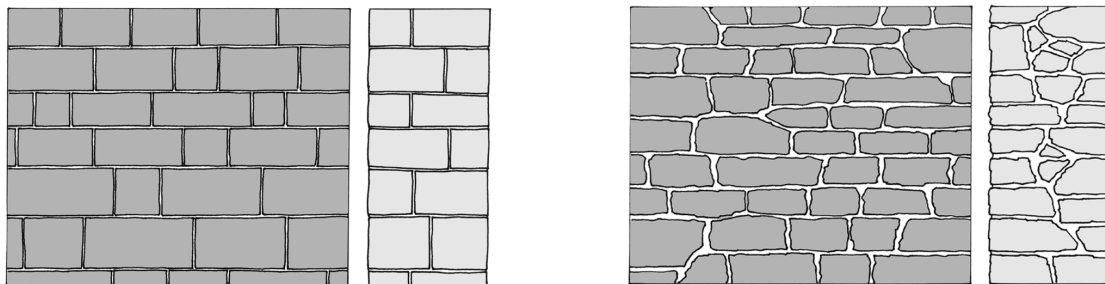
Ashlar masonry – Coursed masonry, elevations and sections
